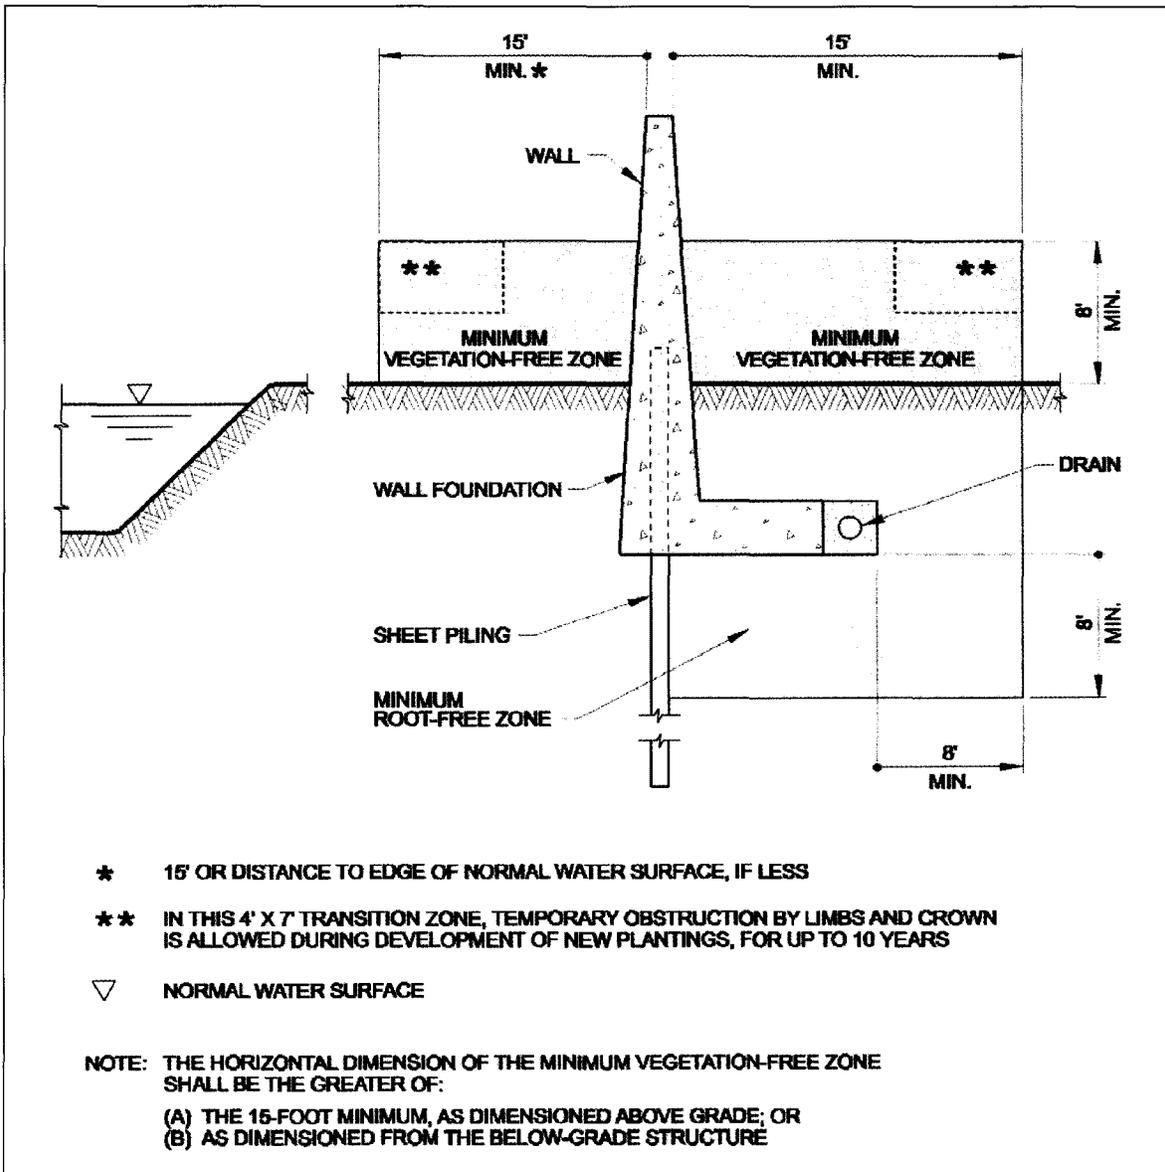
Cantilever-I Type Sheet-Piling Floodwall with Drain.
